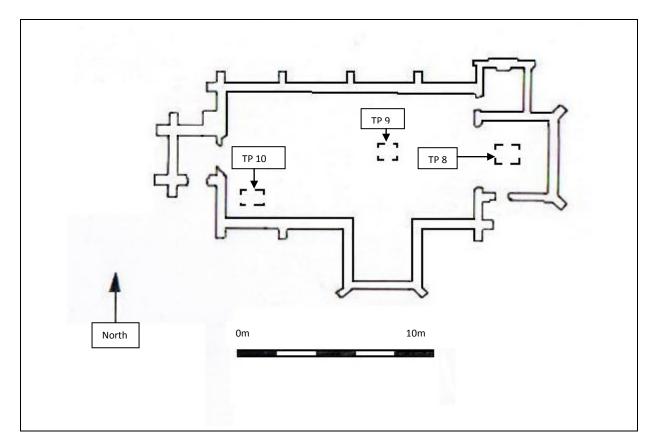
Location of Test Pits 8-10, St Andrew's Church, Thursby
